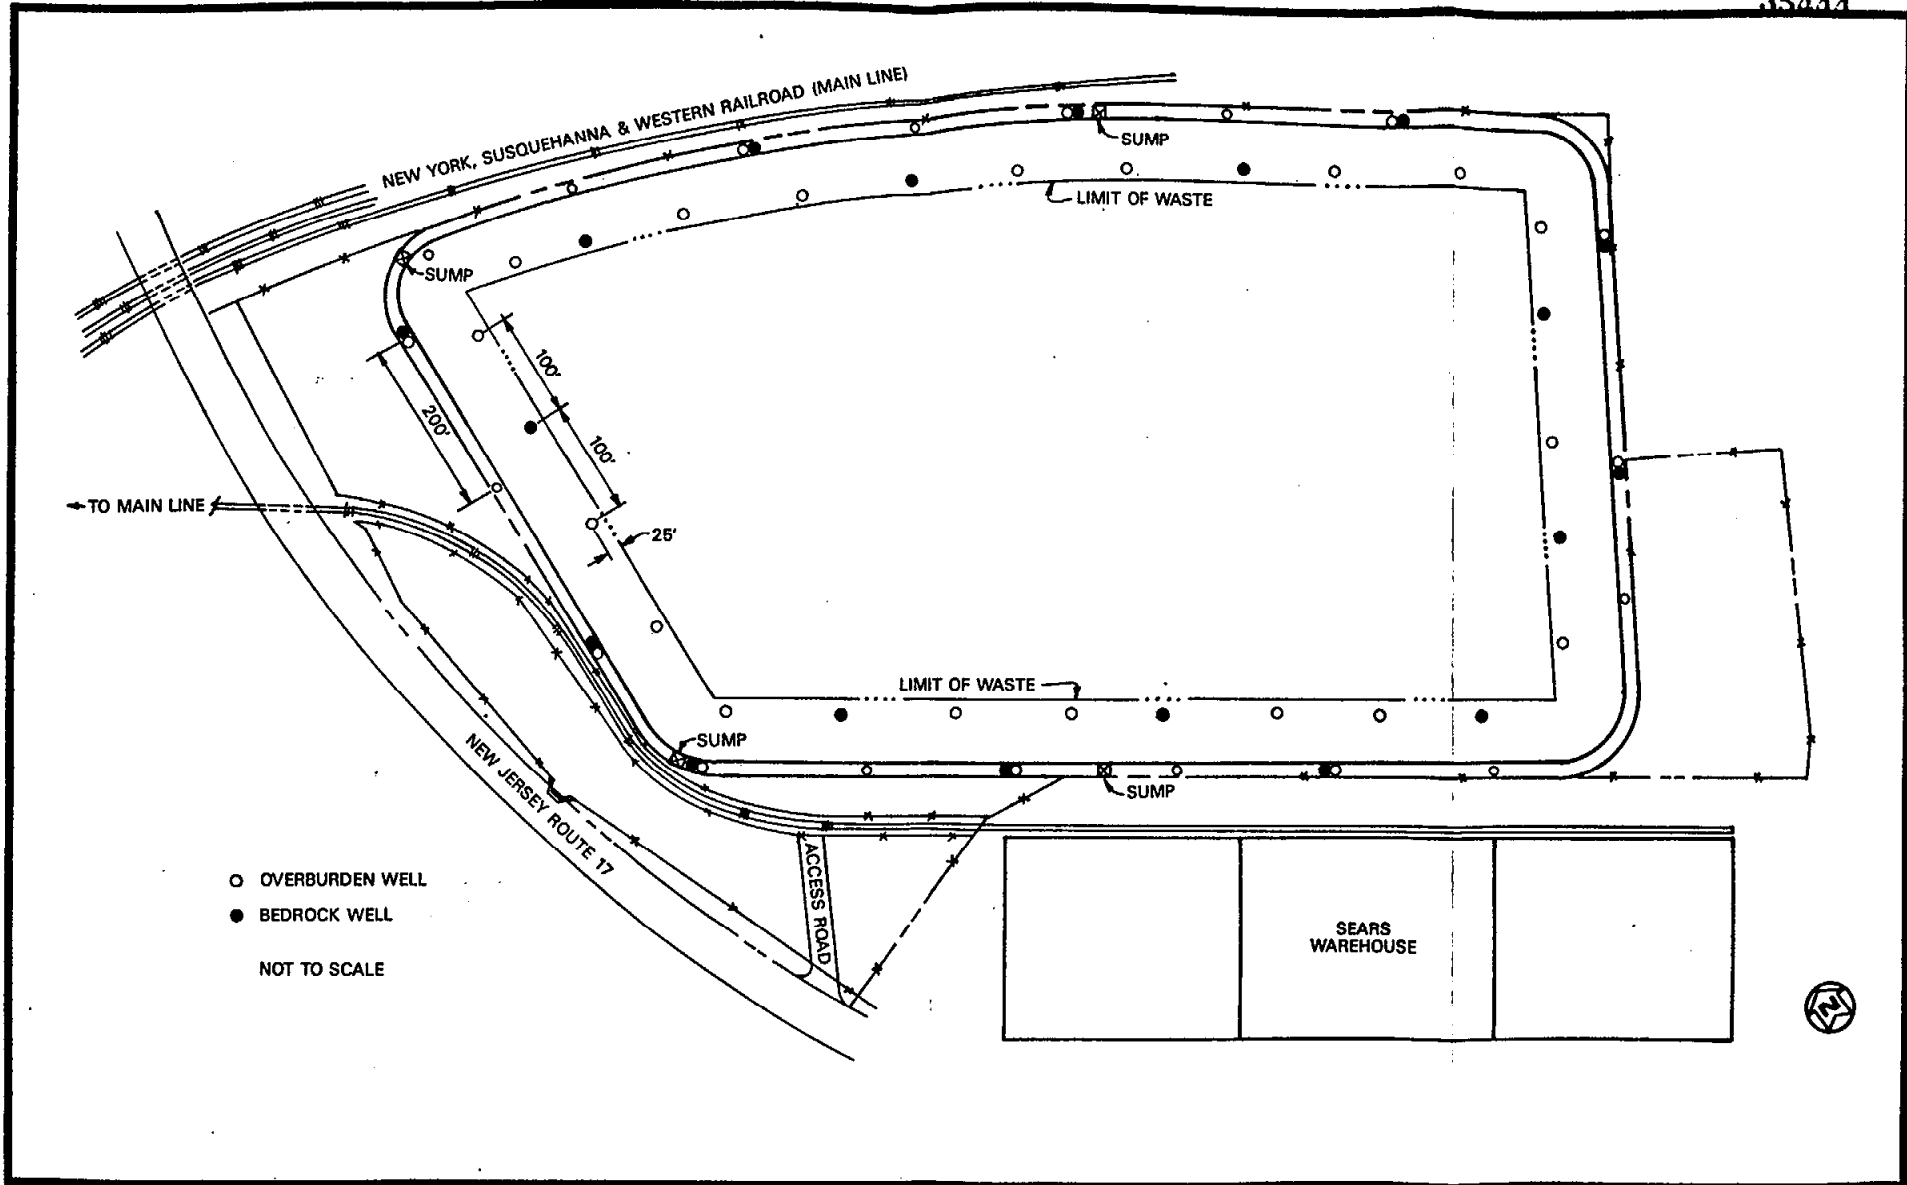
LOCATIONS OF MONITORING WELLS AT THE MAYWOOD DISPOSAL SITE (ALTERNATIVE 2)
